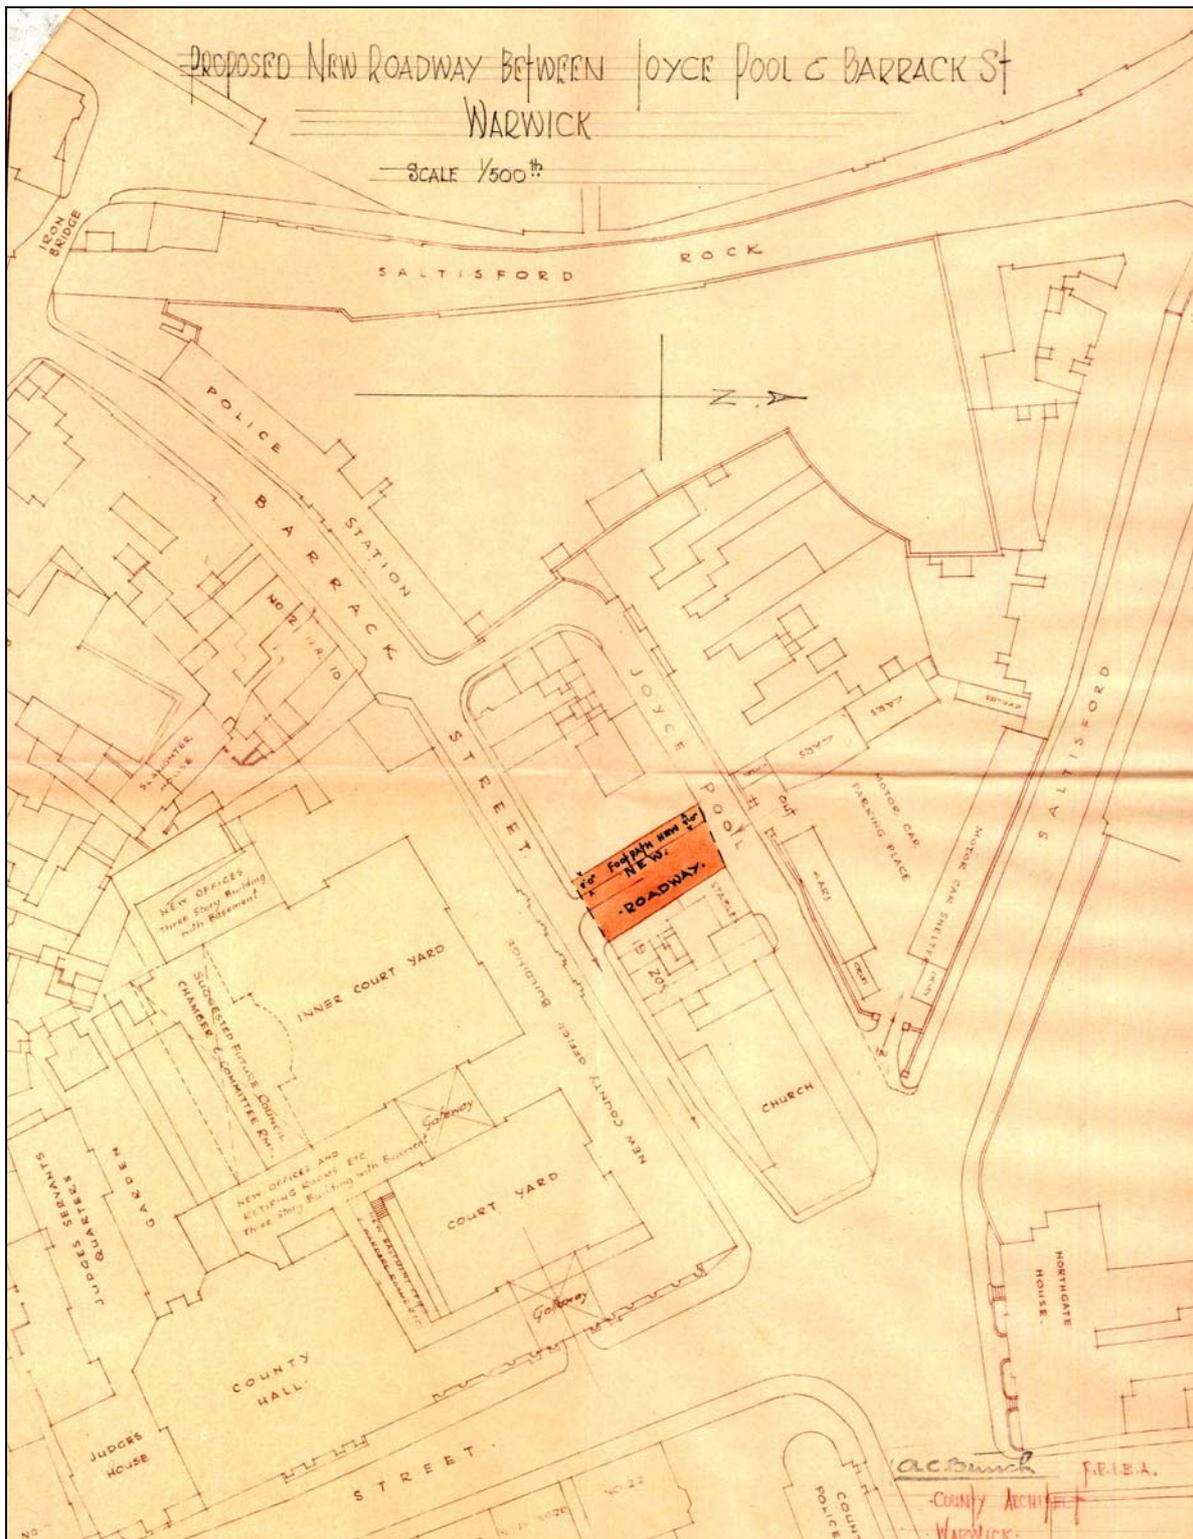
County Architect's plan of 1932 showing new road on the site of Nos 17 and 18 Barrack Street; also shows the 1920s car park at the east end of Joyce Pool / Saltisford (WRO CR 2487 / WBC 835)
